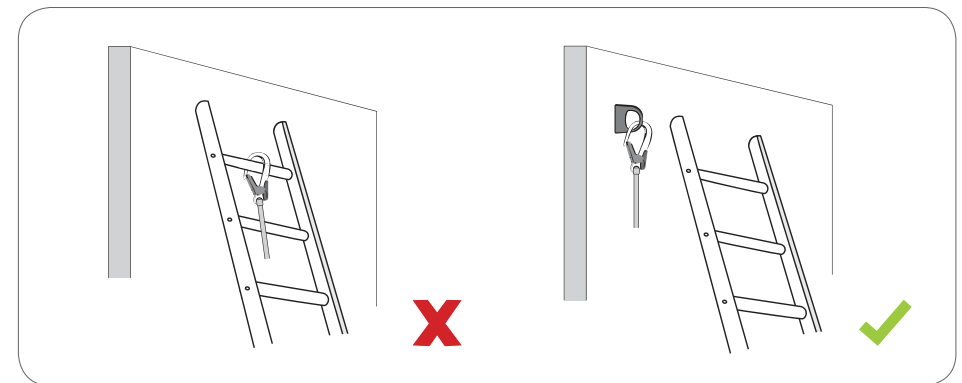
Fall prevention systems should not be connected directly to portable ladders that are leaned against any structures for the purpose of access. It should be connected to a proper anchorage adjacent to the ladder. A connection to a portable ladder should only be made if the top of the ladder is properly secured and the system tested by a competent person.
